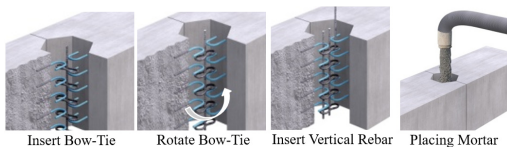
Construction method of developed Bow-Tie horizontal connection
